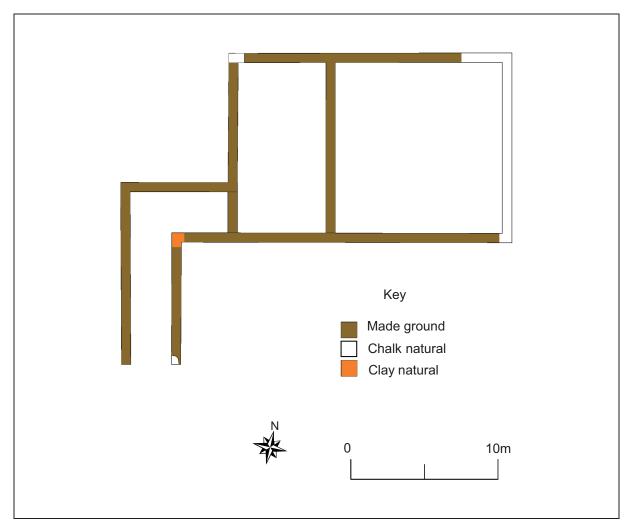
Geology at the base of footing trenches (Scale 1:250)
